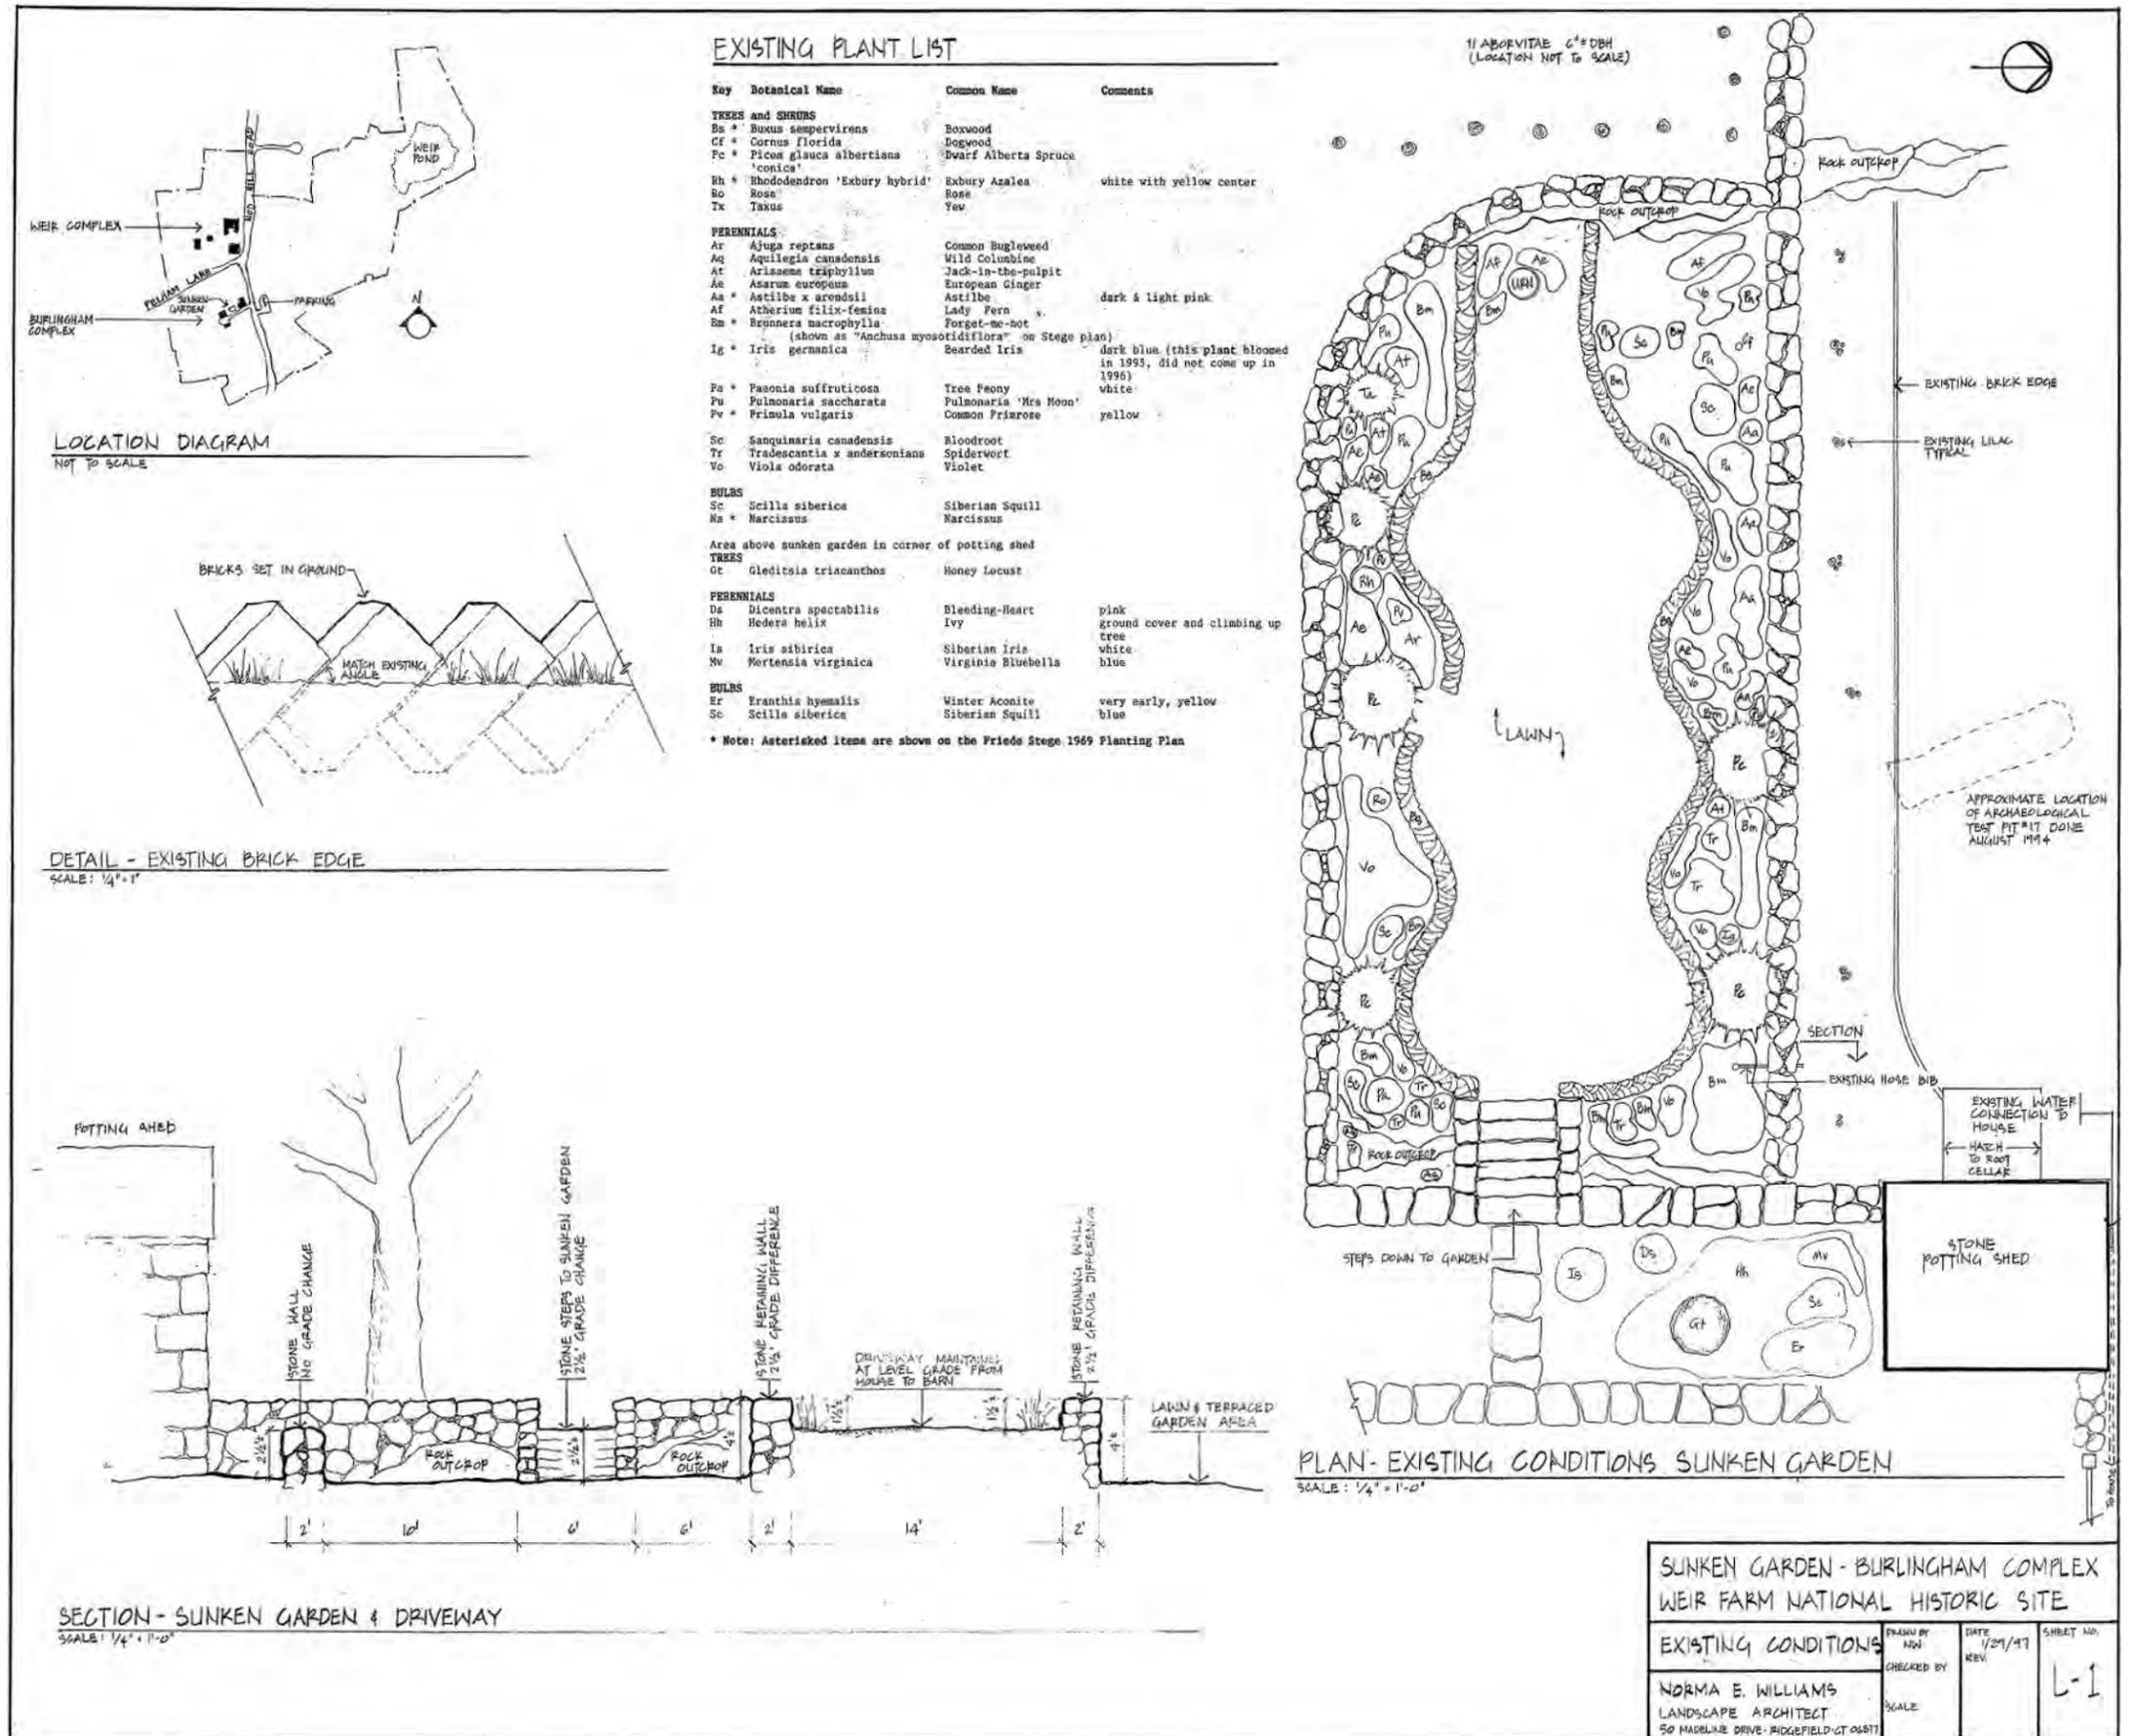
Sunken Garden existing conditions plan, 1997 (Norma Williams).
